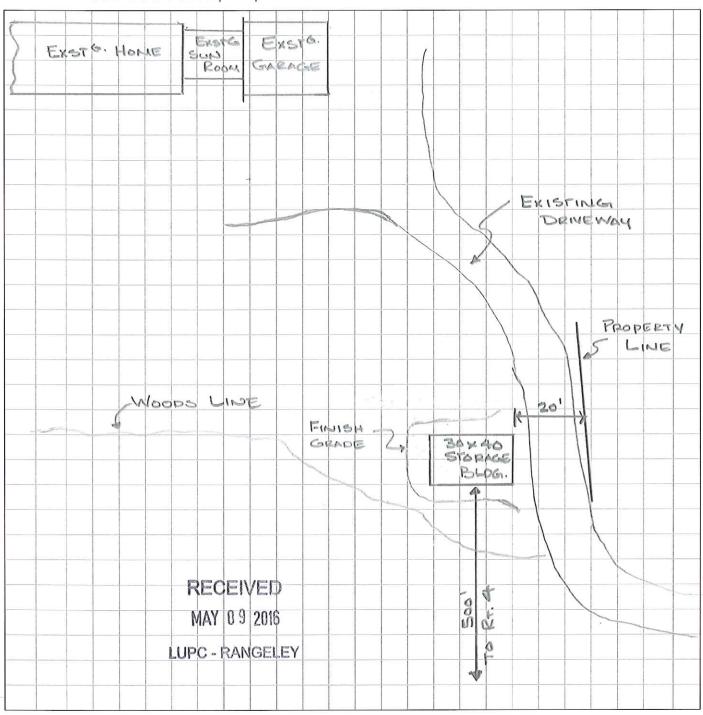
AFTER SITE PLAN (OPTIONAL\*)
